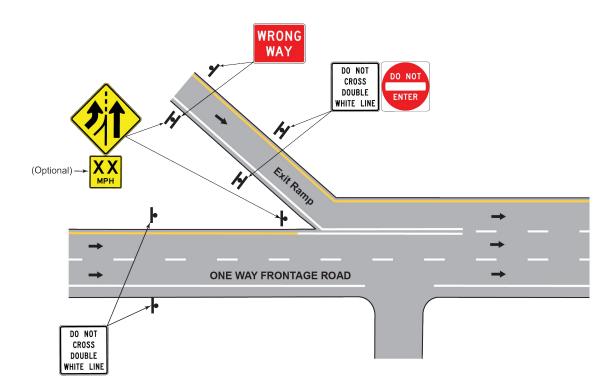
Typical signing and striping for off-ramp from controlled access highway onto frontage road with free lane available to the off-ramp traffic
